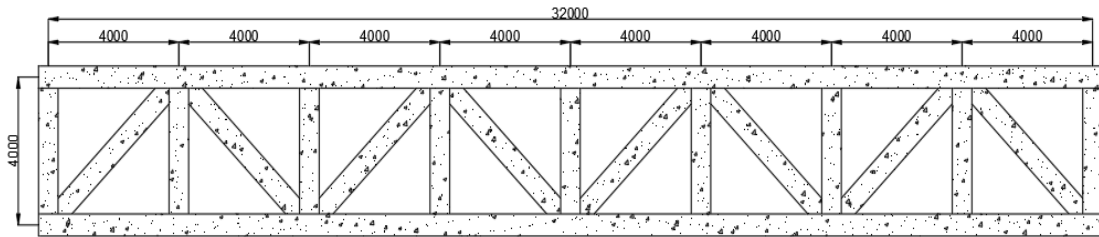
Rectangular plane truss with vertical bar (unit: mm)
